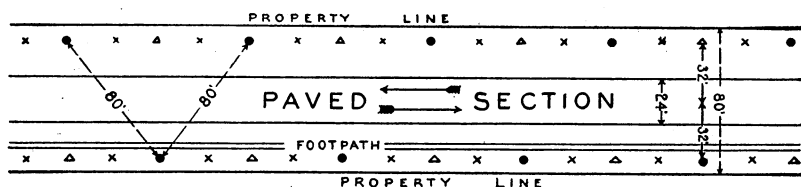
An 80-foot right of way with a 24-foot roadway planted formally, with the tree rows 32 feet back from the center line of the road and the trees planted 80 feet apart as measured across the road, or practically 100 feet apart measured in the rows. Tall shrubs are planted midway between the trees ( $\Delta$ ) and smaller ones between these and the trees ( $\times$ )
